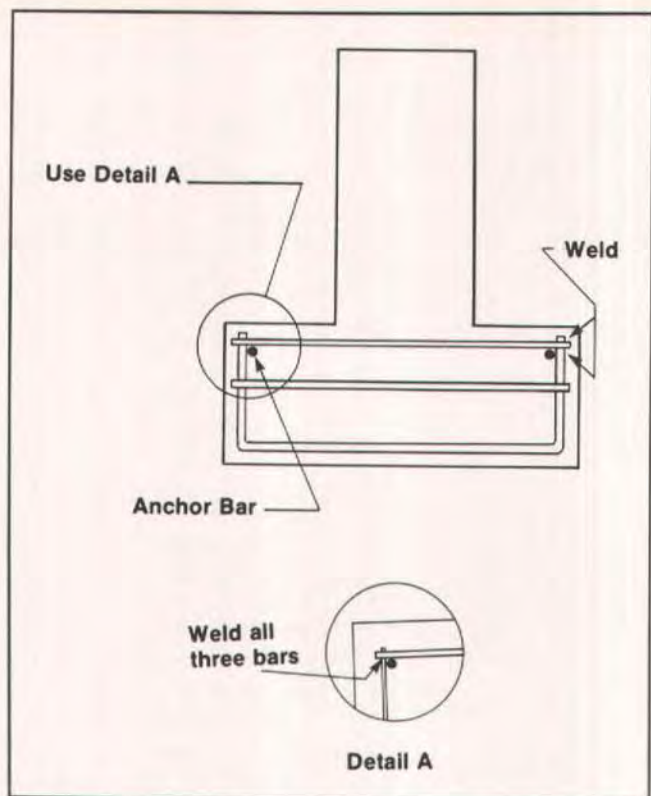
Anchorage of flange transverse bars with the use of welding.
